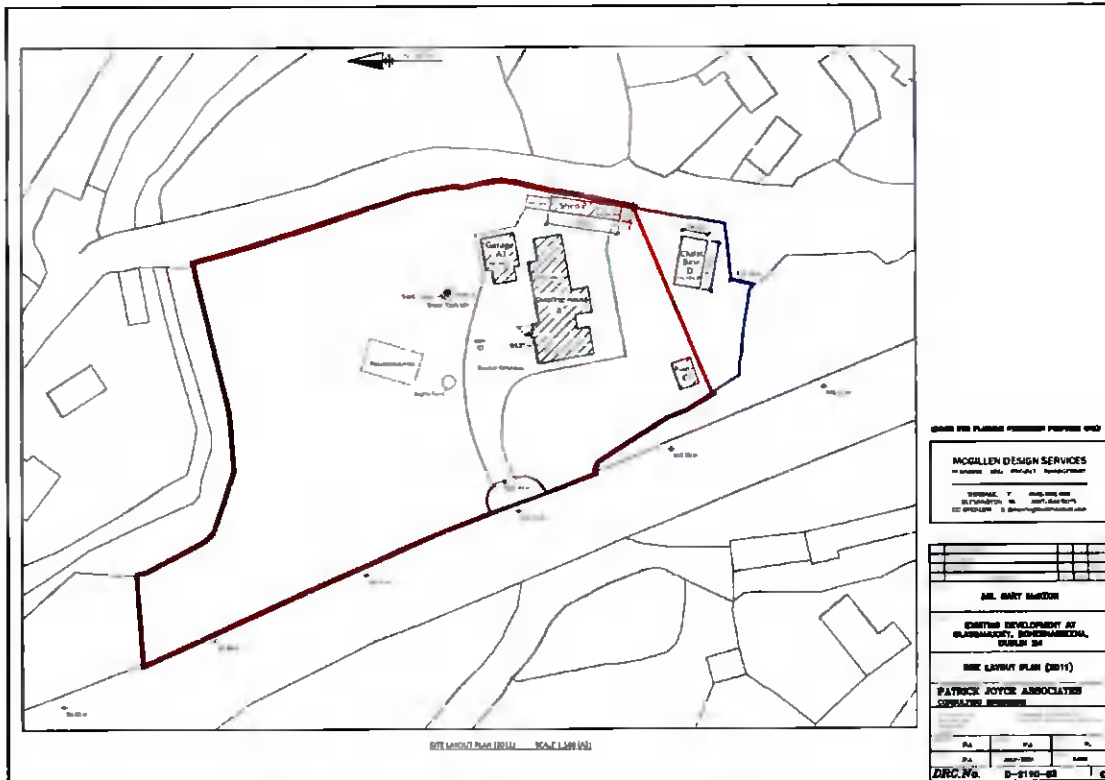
site layout prior to construction of buildings for which retention permission is sought
